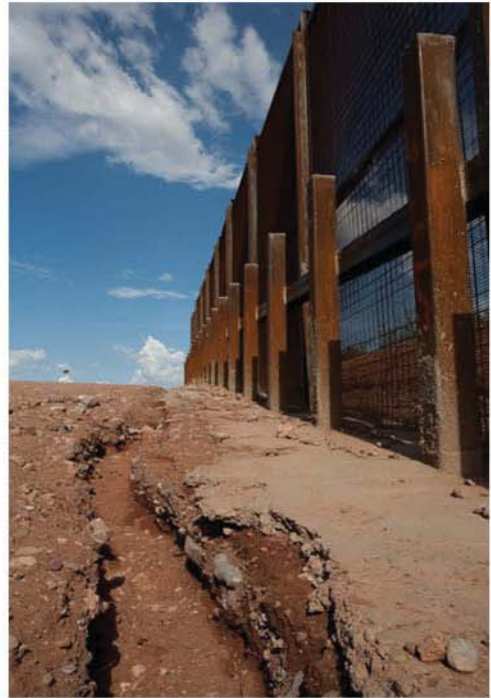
Construction of access roads for border wall machinery. Otay Mountain Wilderness. January 2009.
